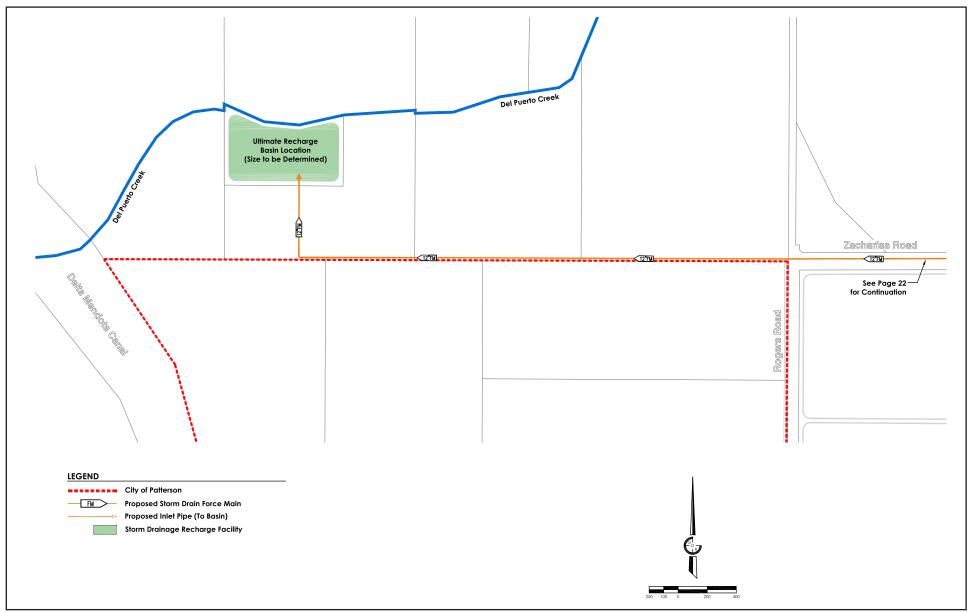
Zacharias Master Plan Storm Drain, Recharge, and FEMA Solution Facilities
